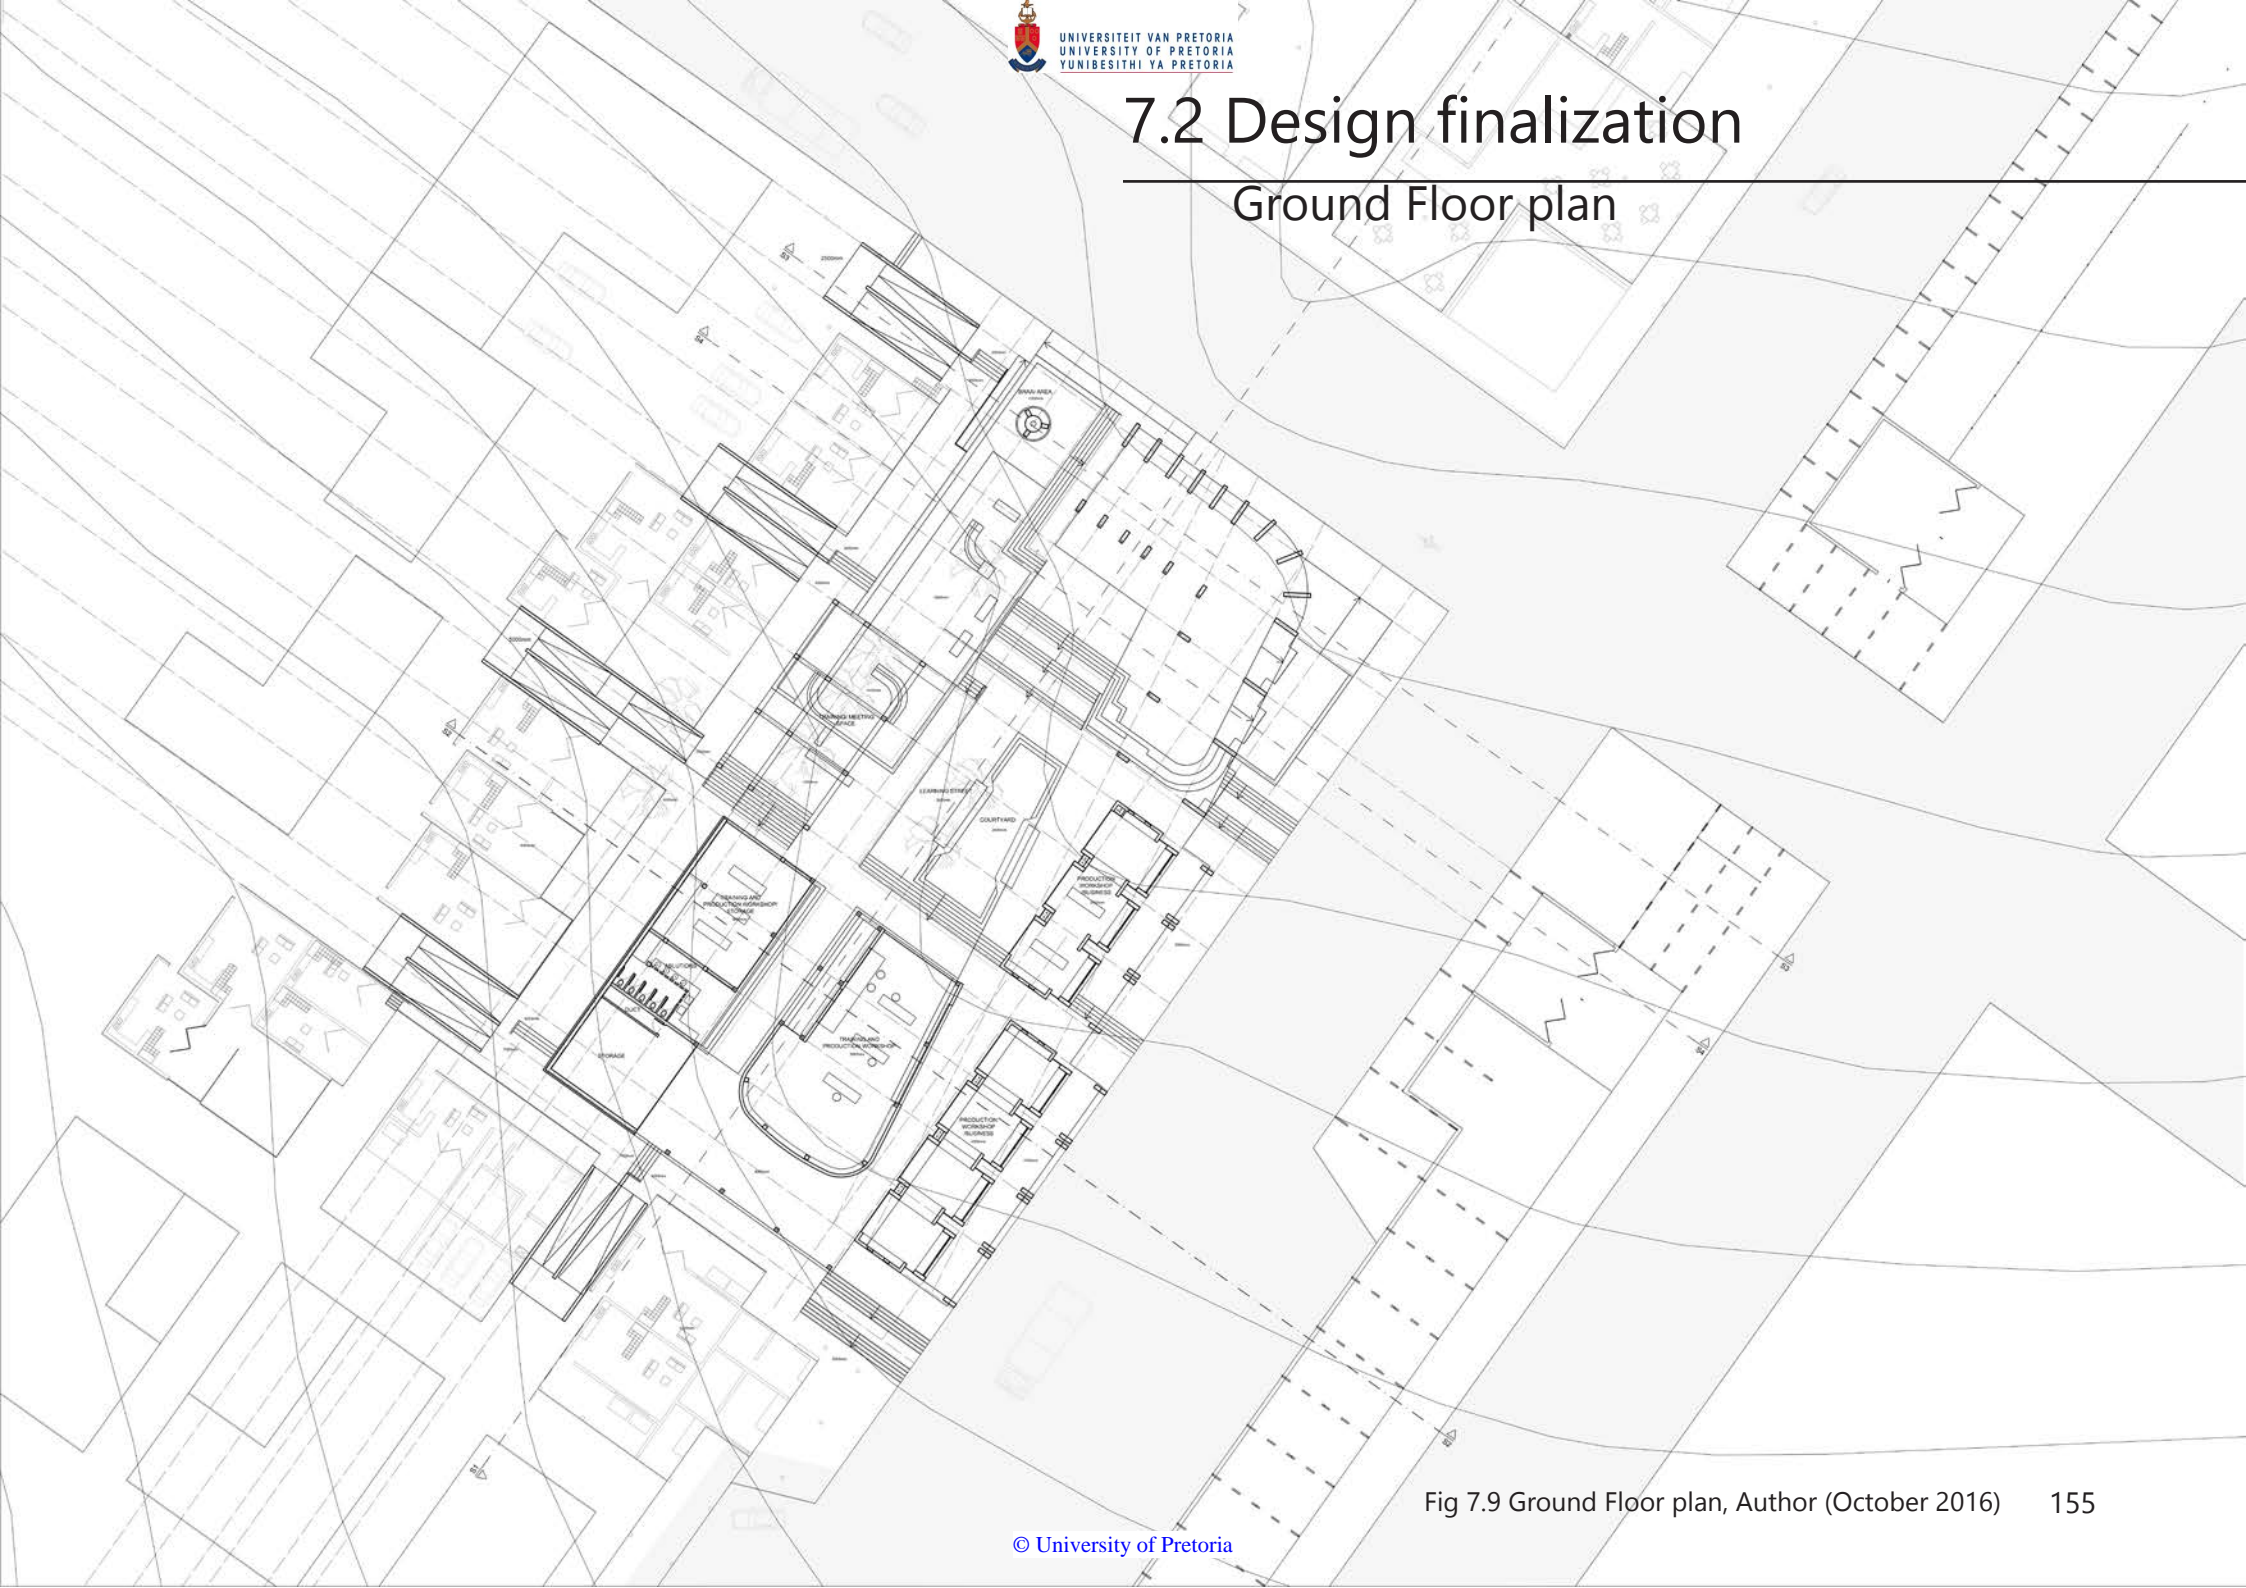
Ground Floor plan, Author (October 2016) 155
